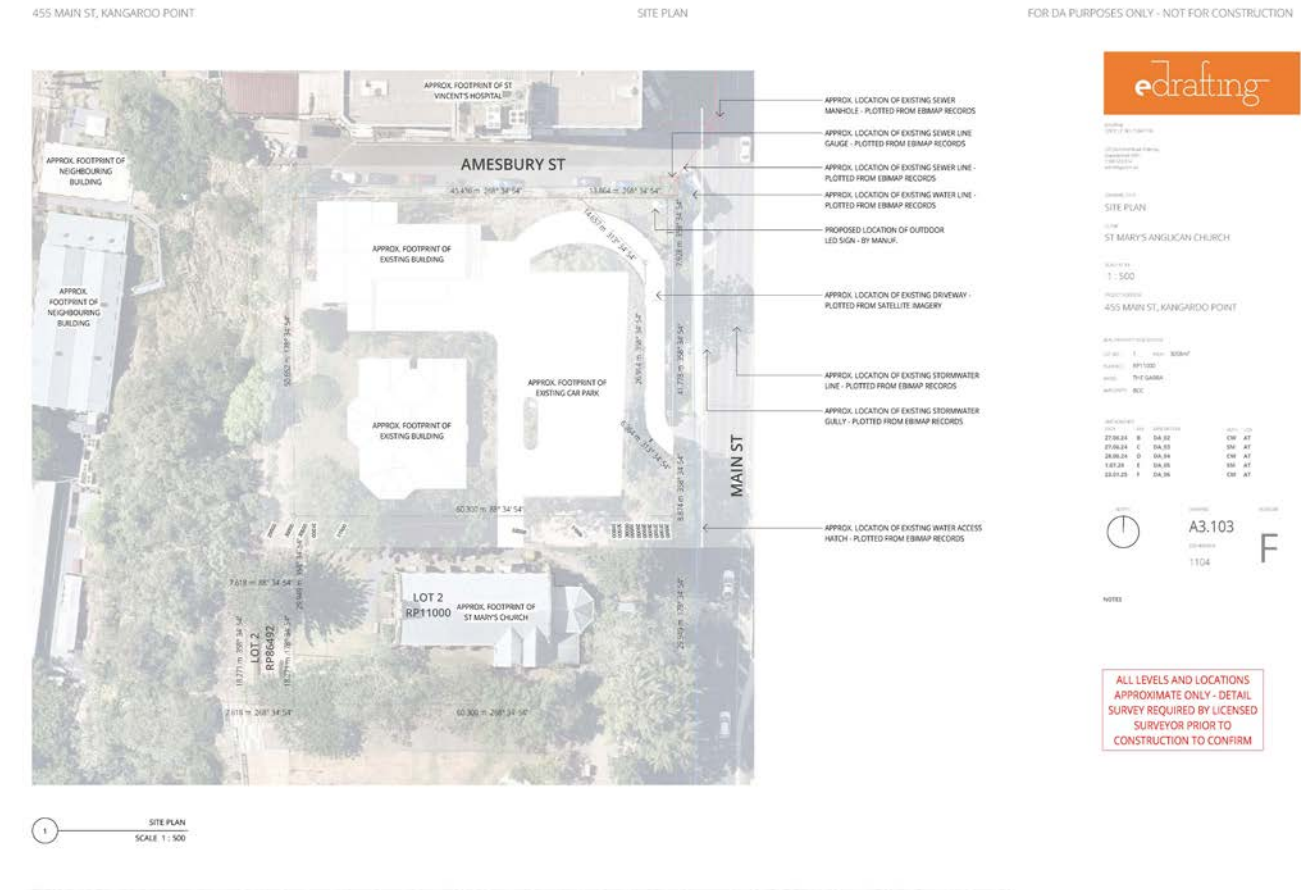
Proposed site plan showing the contemplated realignment of lot boundaries
